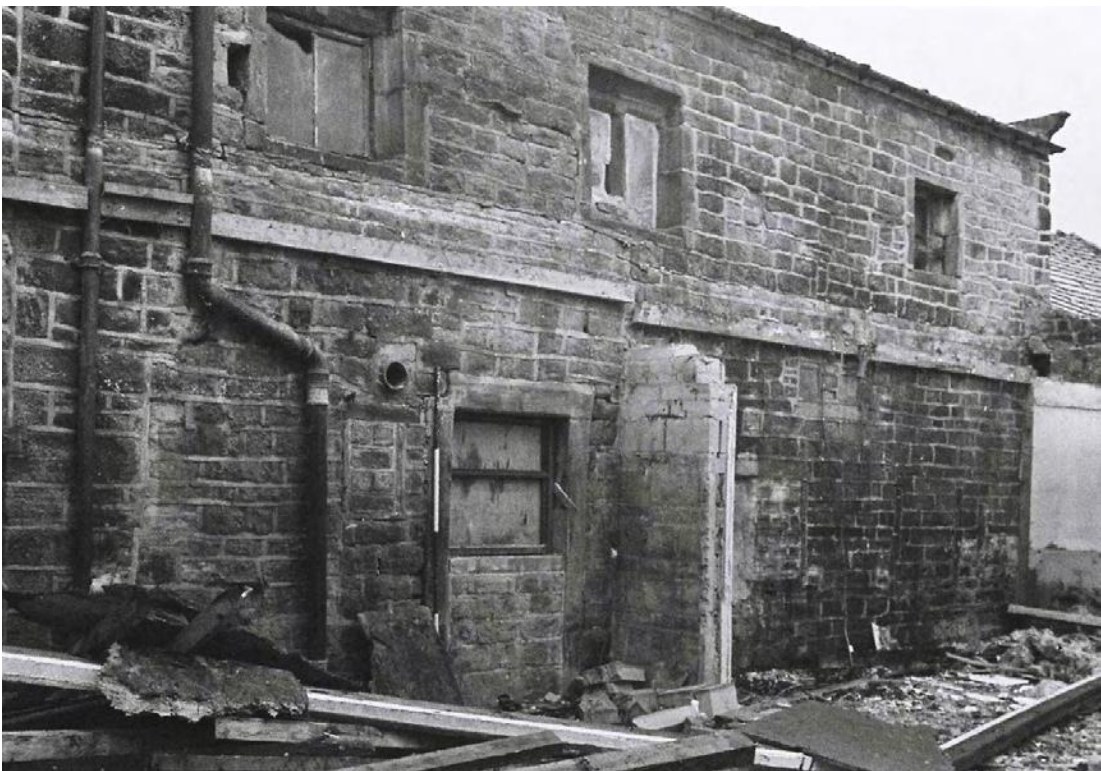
Shaw House Farm: Barn Exterior (after demolition of Lean-to). Facing South-west.
